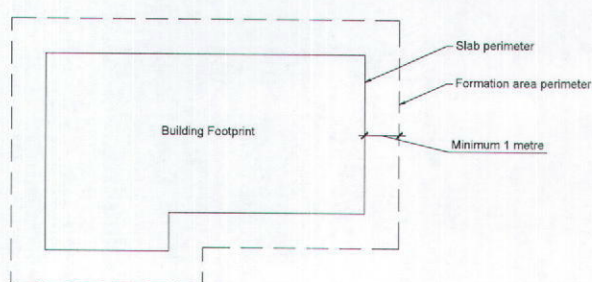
Plan of Formation Area (With Clause 7.5.3 of NZS 3604:2011 "Timber Framed
